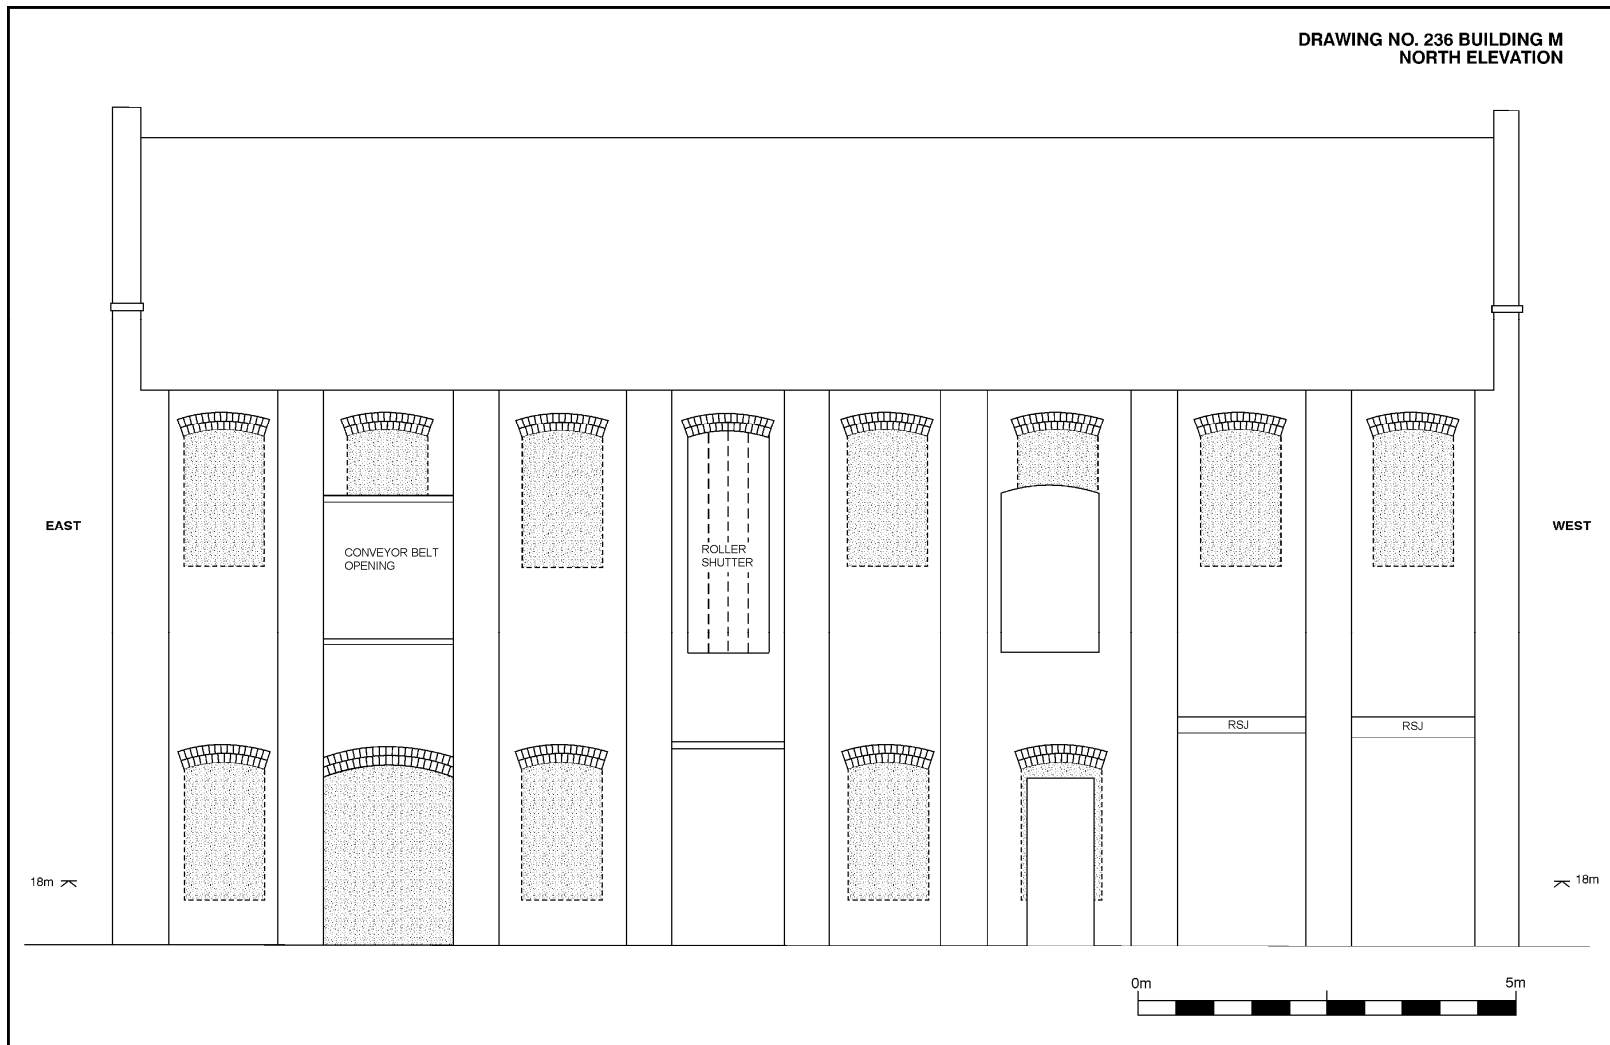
Survey drawing of the north elevation of Building M (scale 1:100)
